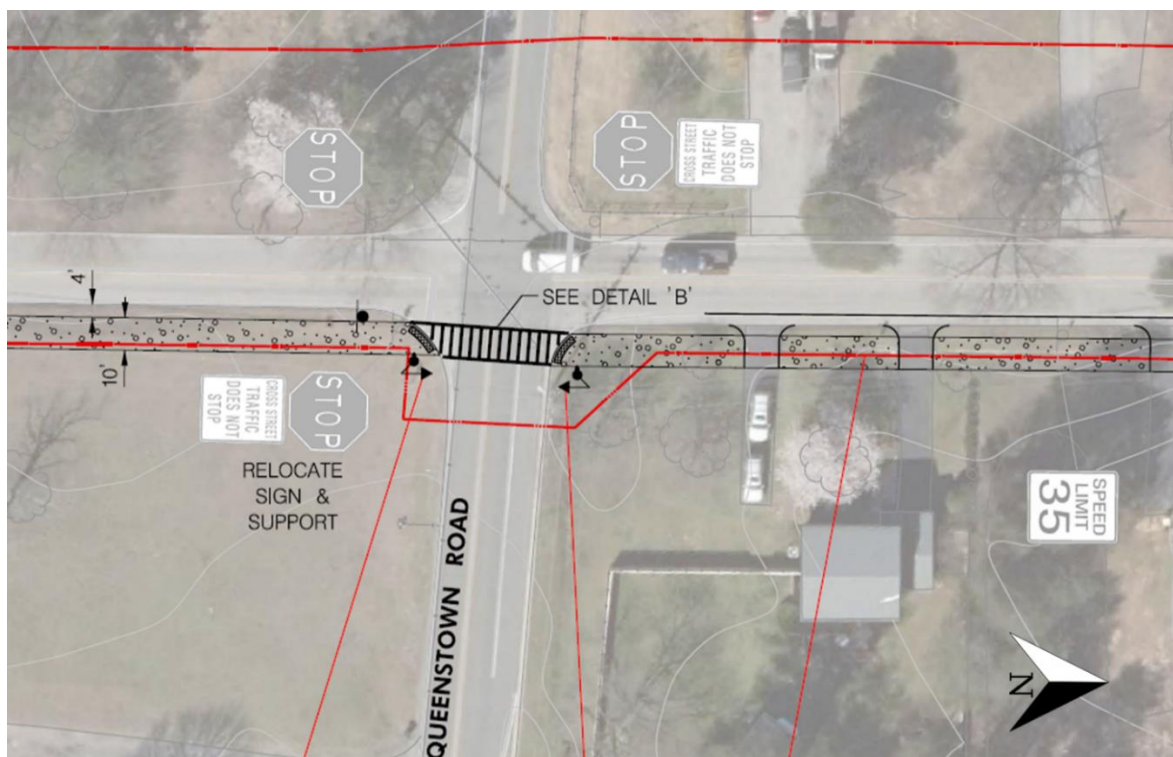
Preferred Alignment at the intersection of WB&A Road at Queenstown Road
